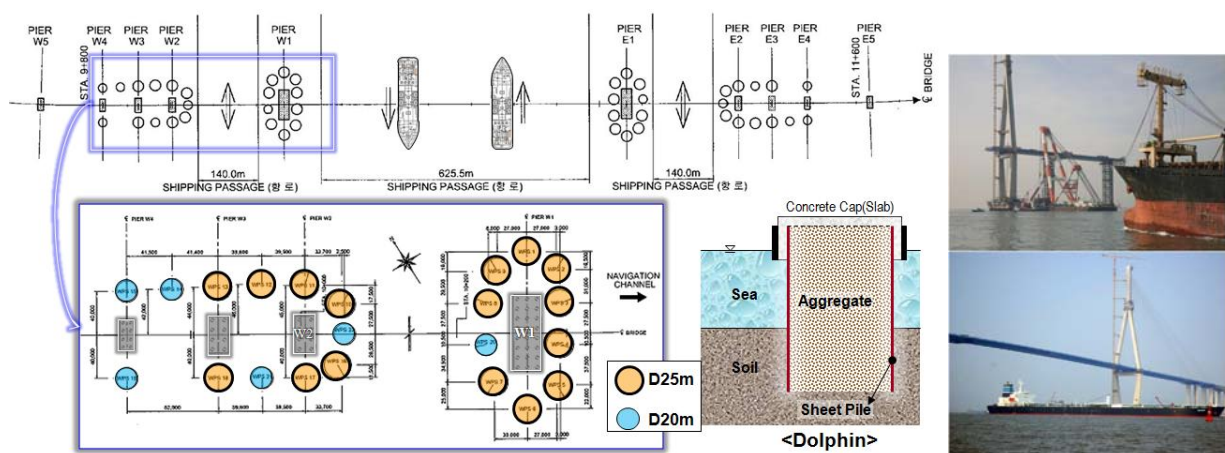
Layout and cross-section of the dolphins (right : large ships passing the bridge)
